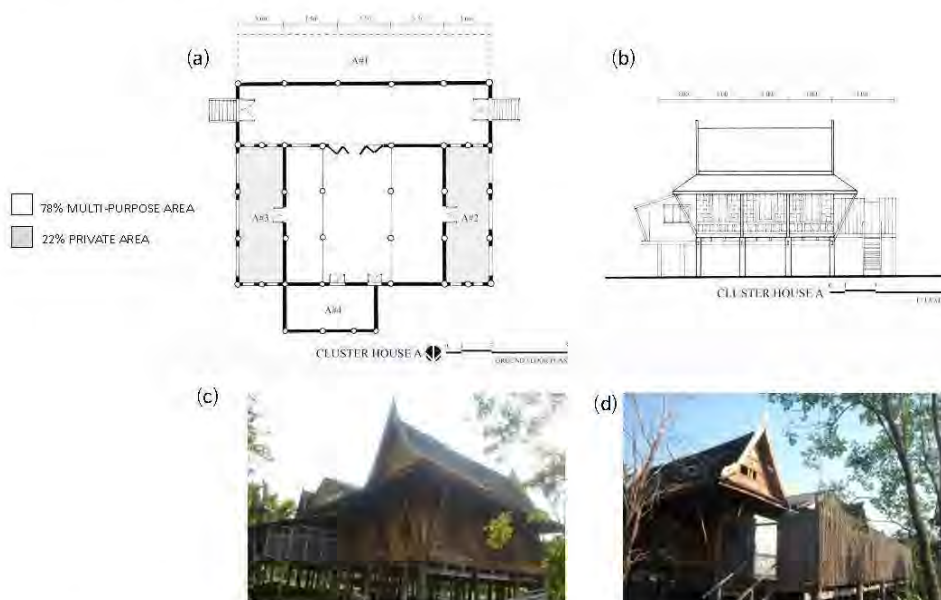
House Cluster A (a) Second Floor Plan (b) Elevation (c) House A#2 (d) House A#2
